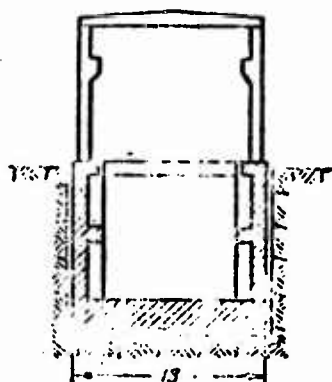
Sectional above grade frame and underground monolithic part of the crushing mill housing.
